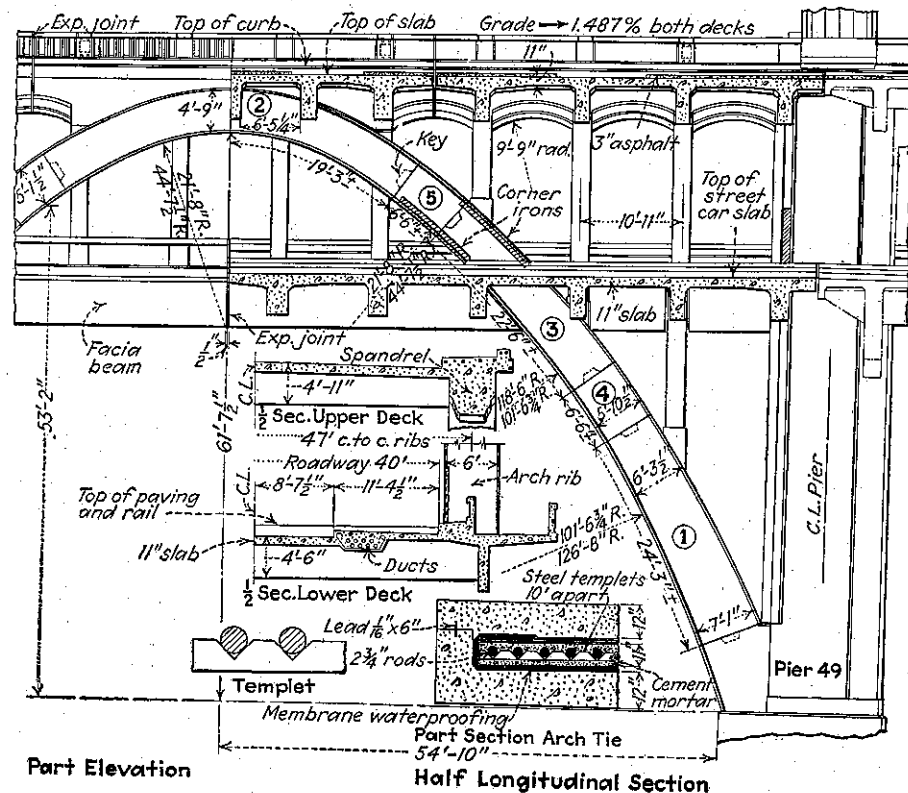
Arch span over Mill Creek. Note double-deck construction.
